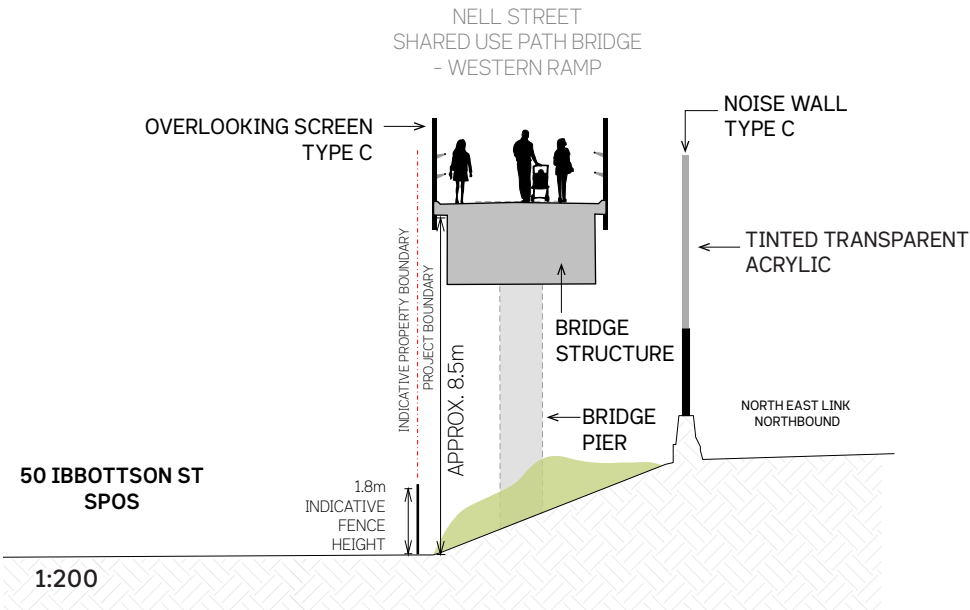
Detailed Analysis: Section B - Proposed architectural and structural elements adjacent to 50 Ibbottson Street
